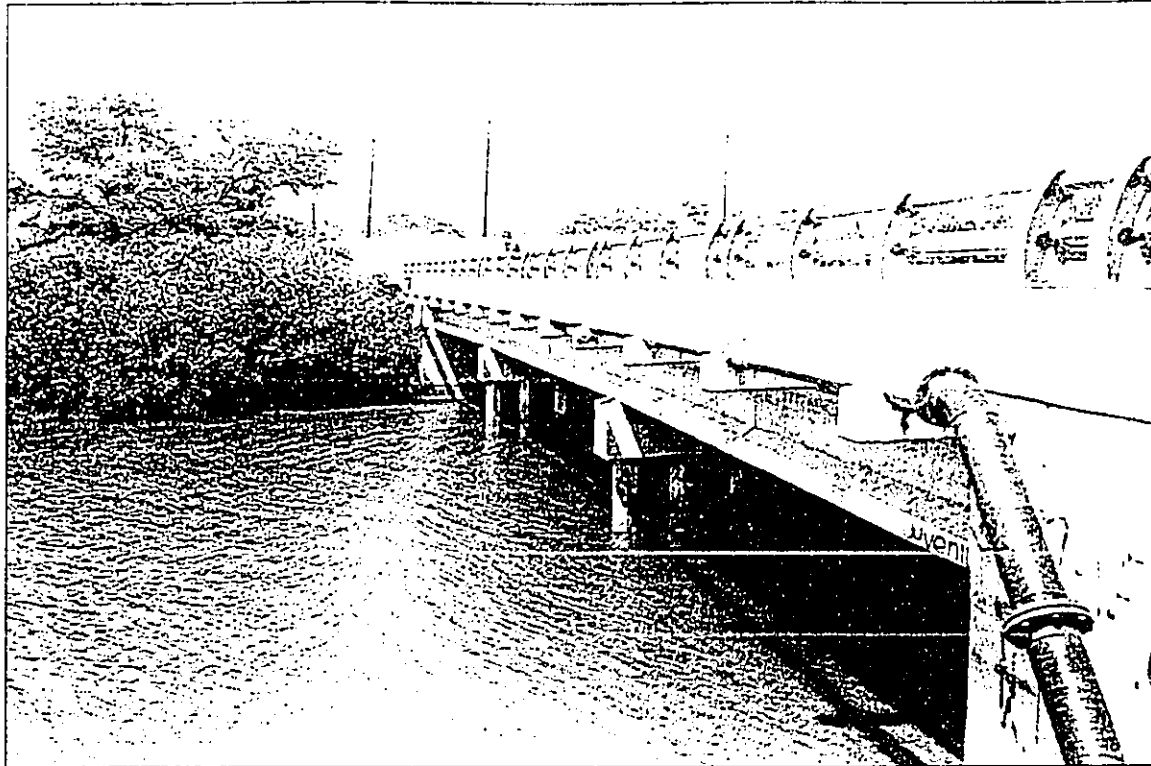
Start of the proposed project area at Walpio Point Access Road.
